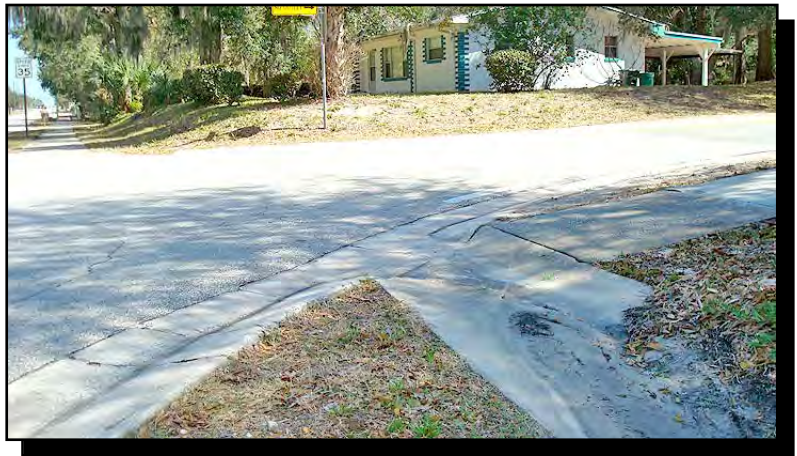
Sidewalk Ends in Flume Inlet at the Intersection of Taylor Road and Boggs Ford Road (Looking East)
